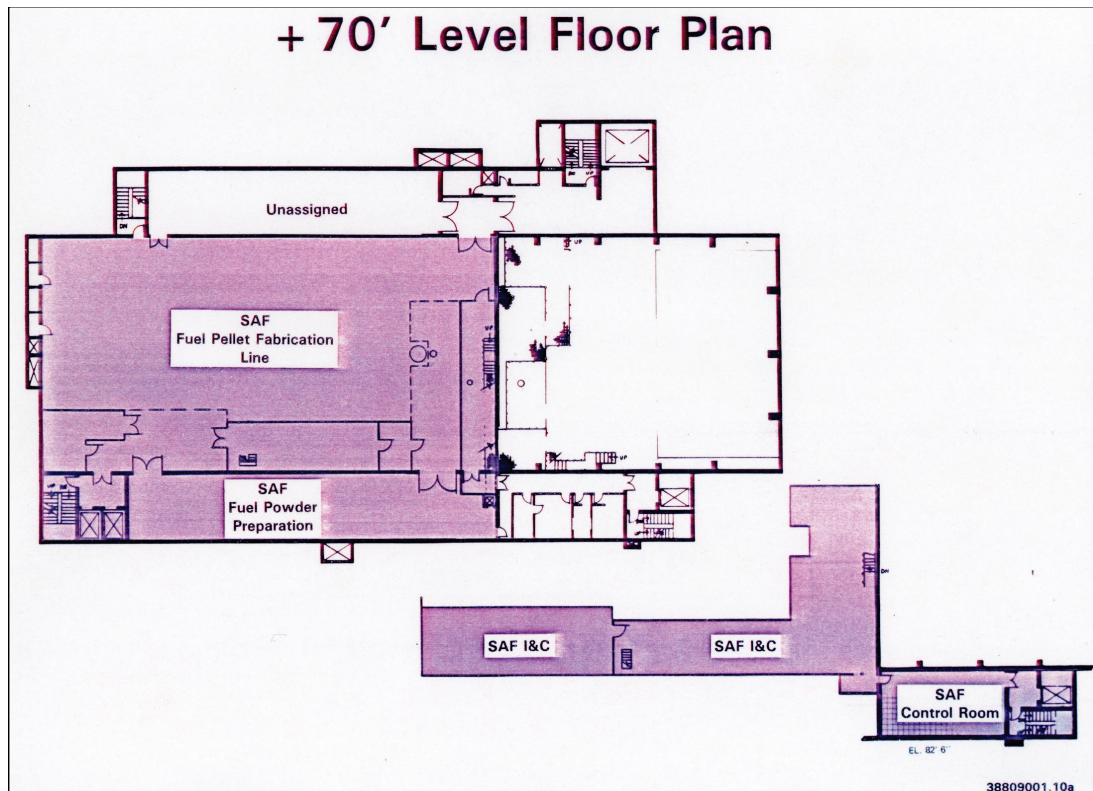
FMEF Process Building, 70 Foot Level Floor Plan
